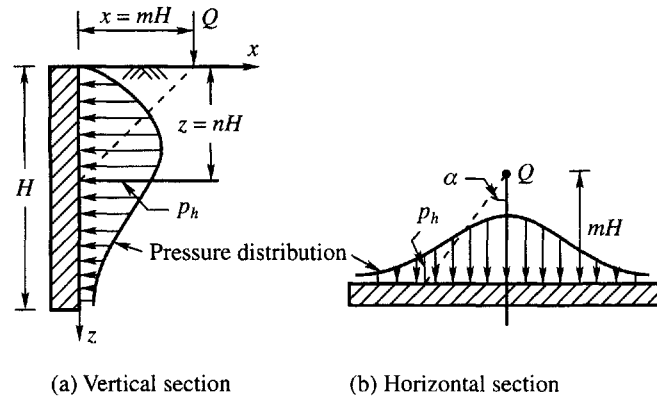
Lateral pressure against a rigid wall due to a point load
